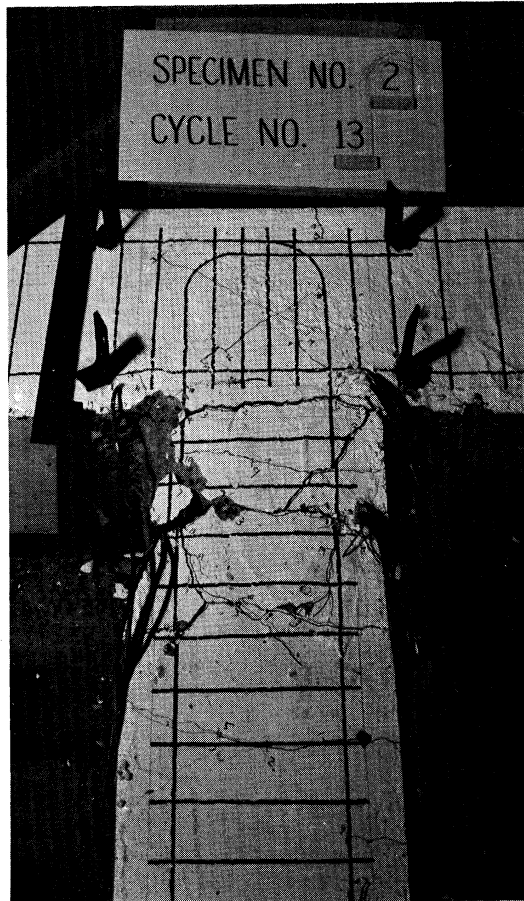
Cracking in Joint for Specimen 2 with 40 kip Column Axial Load after Severe Earthquake Loading
